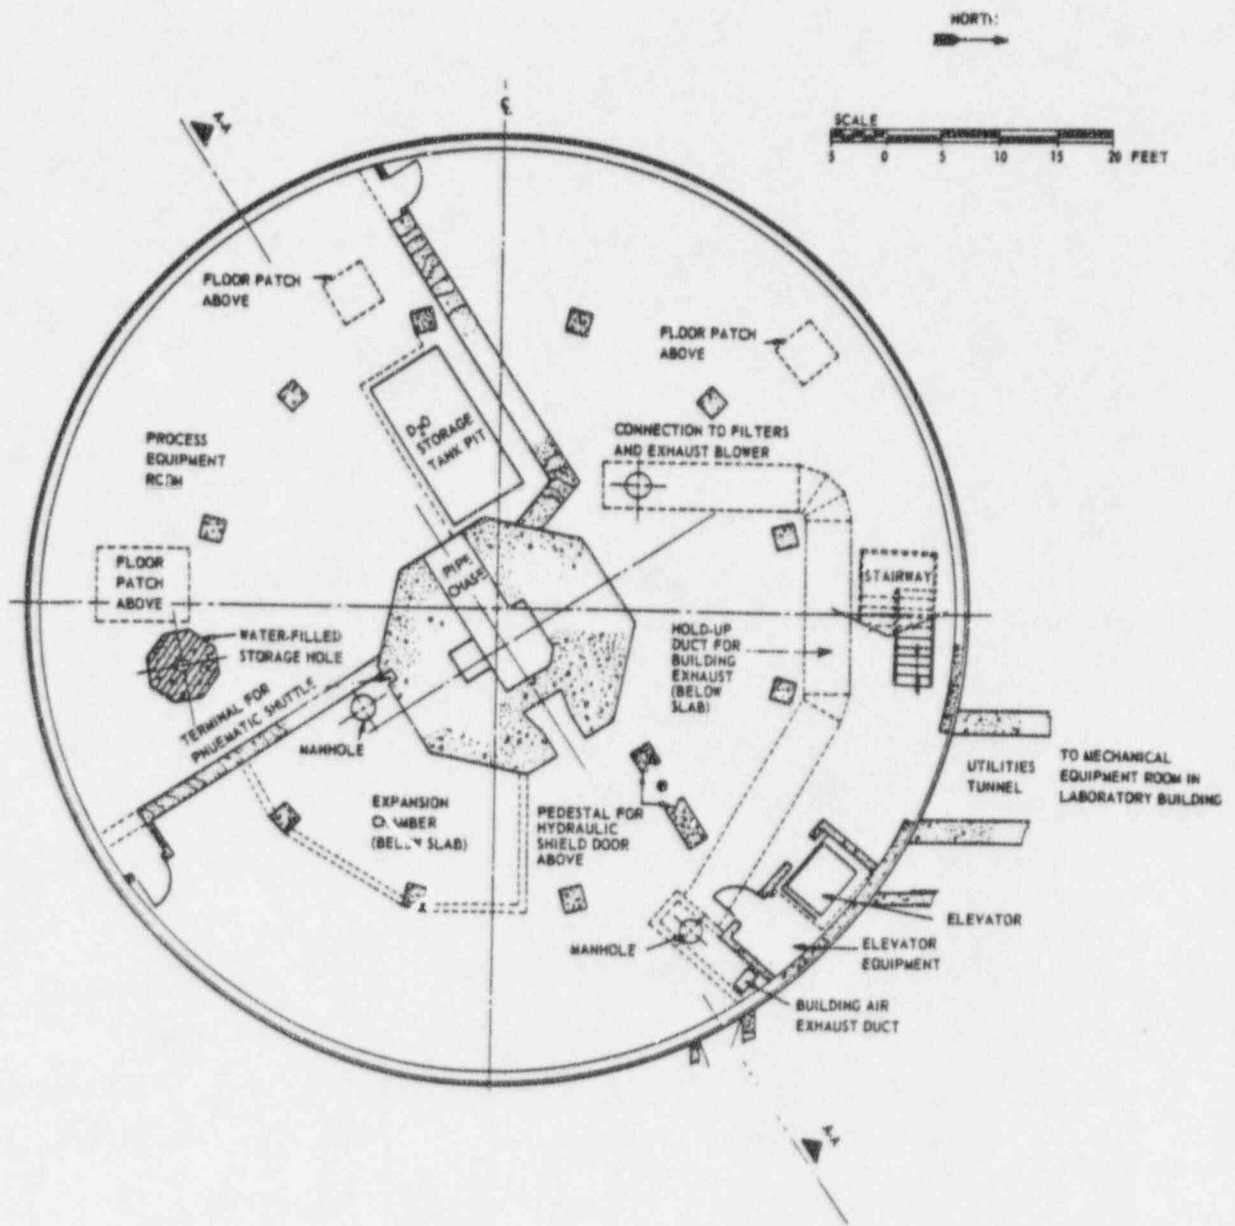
Reactor Containment Building Basement Floor Plan.
